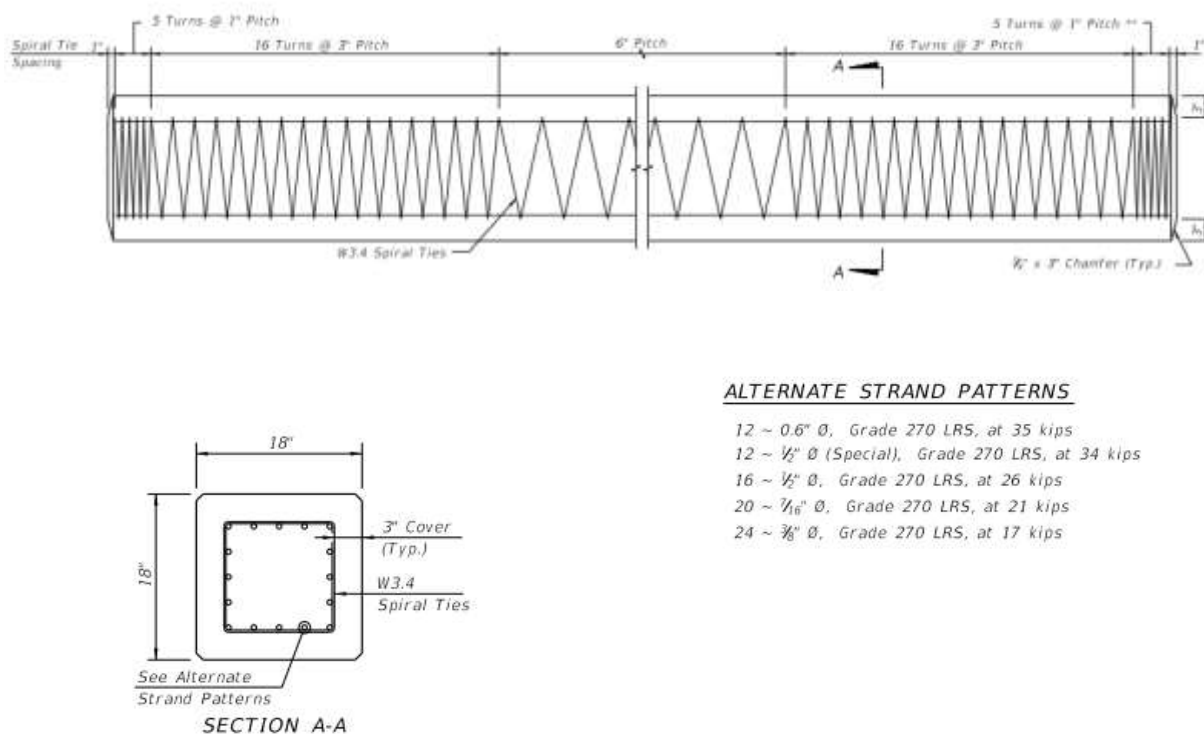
18" square prestressed concrete pile - FDOT design standards (Florida Department of Transportation, 2021)
